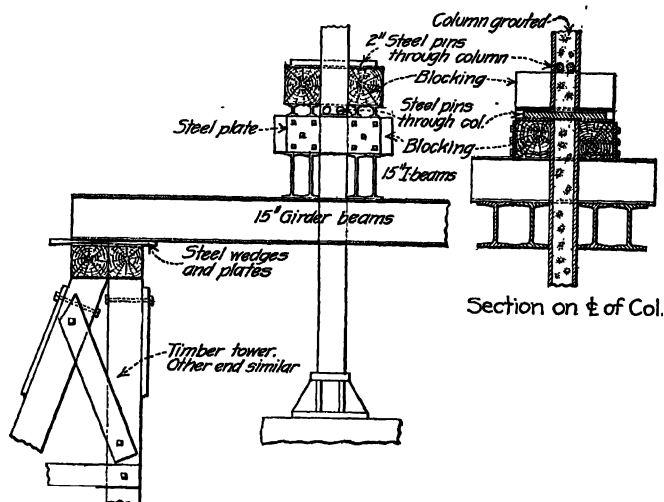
Needling for 12-in. cast-iron column. Load, 250 tons per column.
